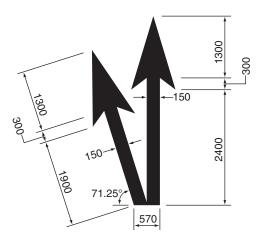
Diverge arrow used by New York State DOT (*Source:* New York DOT pavement marking details, October 22, 2001, Drawing M685-5R1, Sheet 5 of 5).
